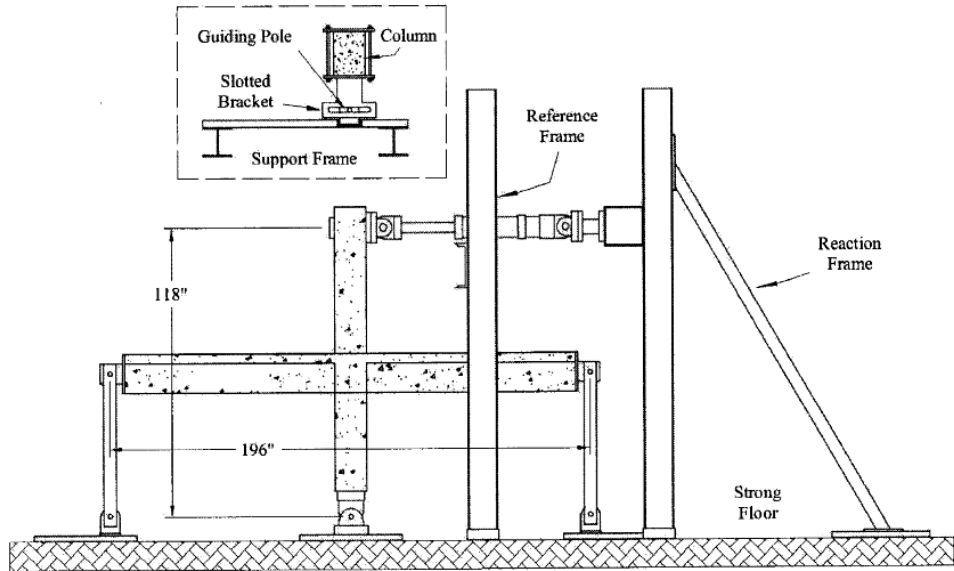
Test Setup - Specimens of Shin and LaFave
